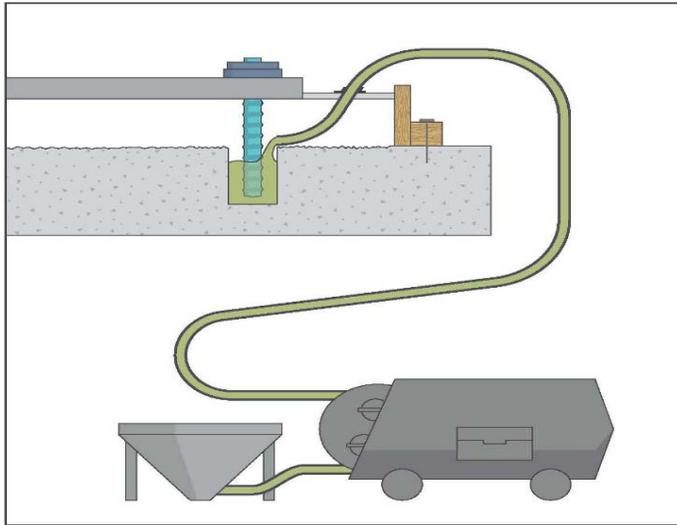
For large pours or long distances a pump can be used to fill bolt holes
